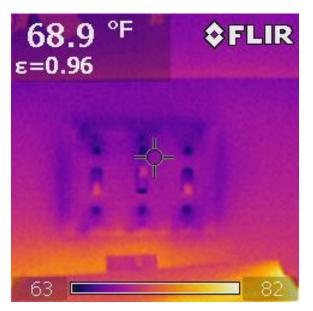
Infiltration Detection—Light Switch on Exterior Wall
